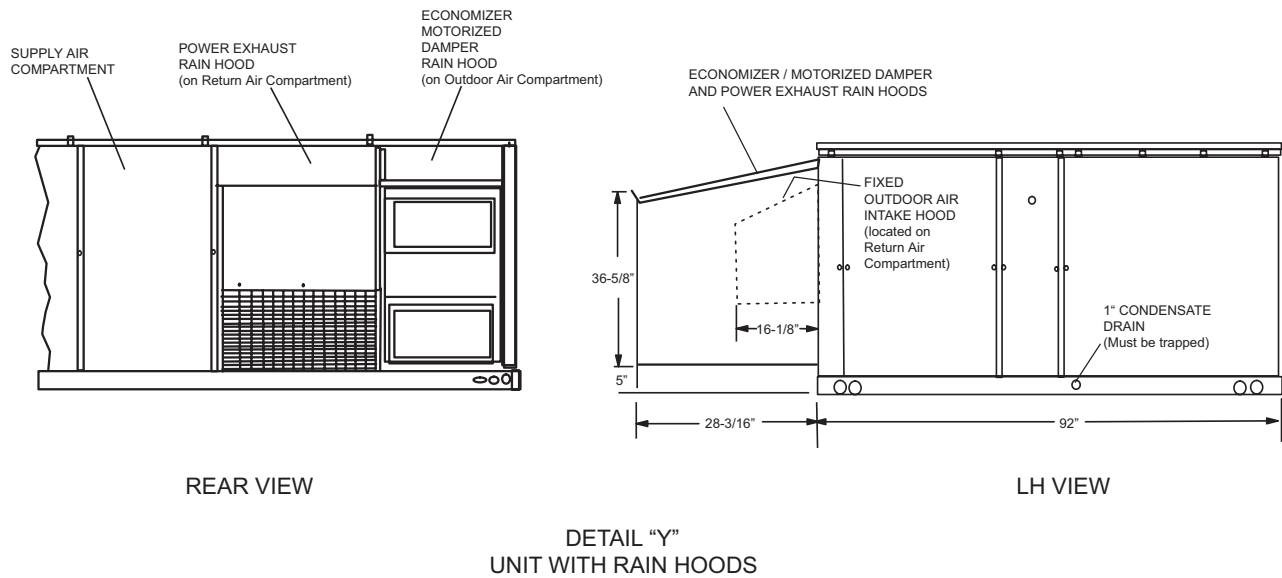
UNIT DIMENSIONS BP180 AND 240 (RAINHOOD)
